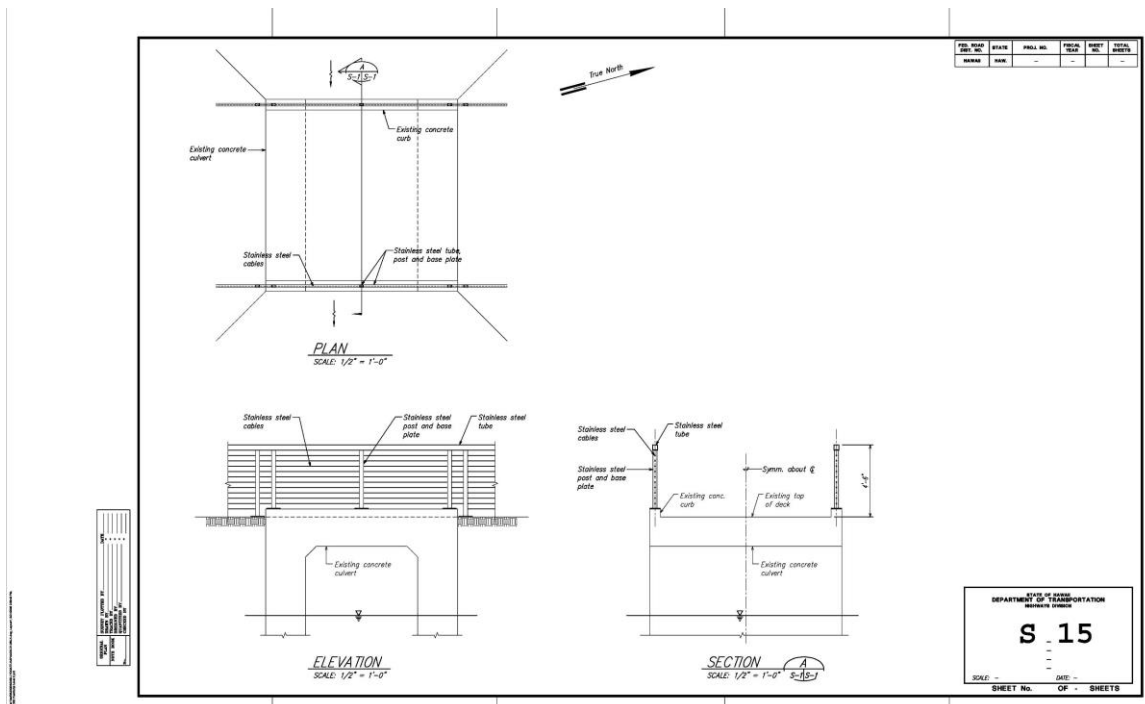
Retrofit of the box culvert with a new concrete deck and safety railings
